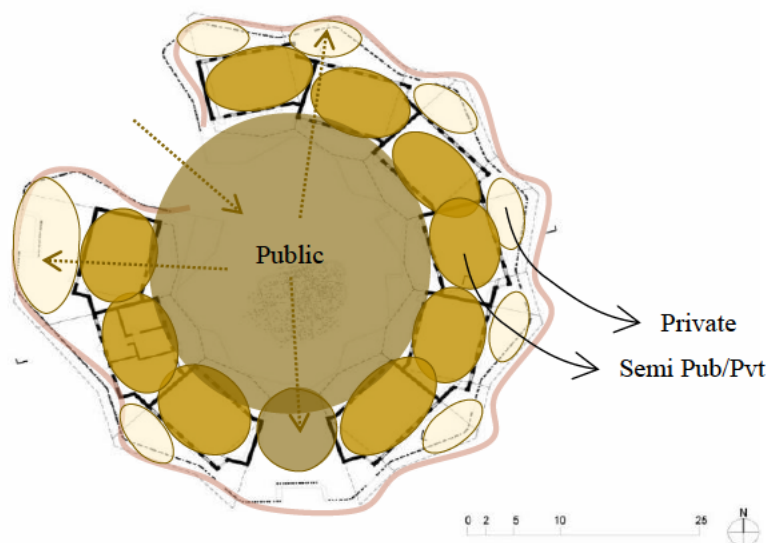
vii: The ground floor plan arrangement of spaces and form of spaces. (Source: www.kere-architecture.com)
